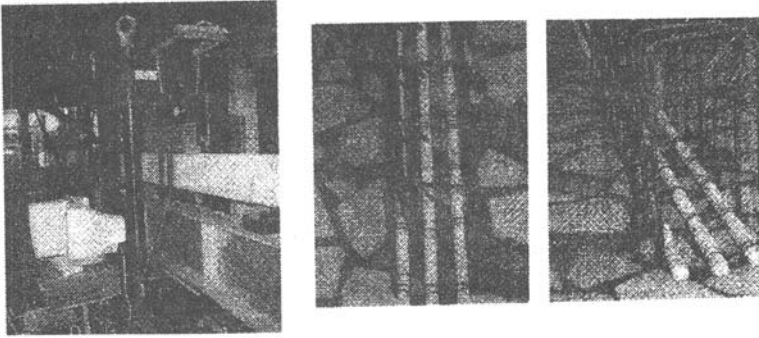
Experimental set-up; FRP reinforcement detailing.
